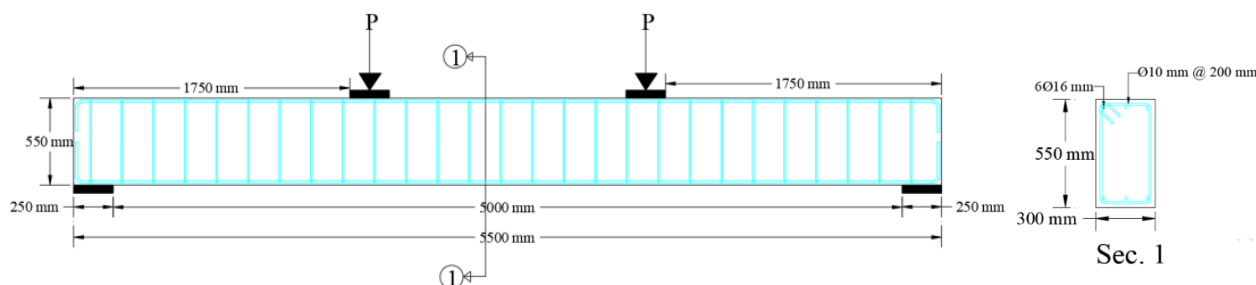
The adopted full-scale dimensions and reinforcement of beam
